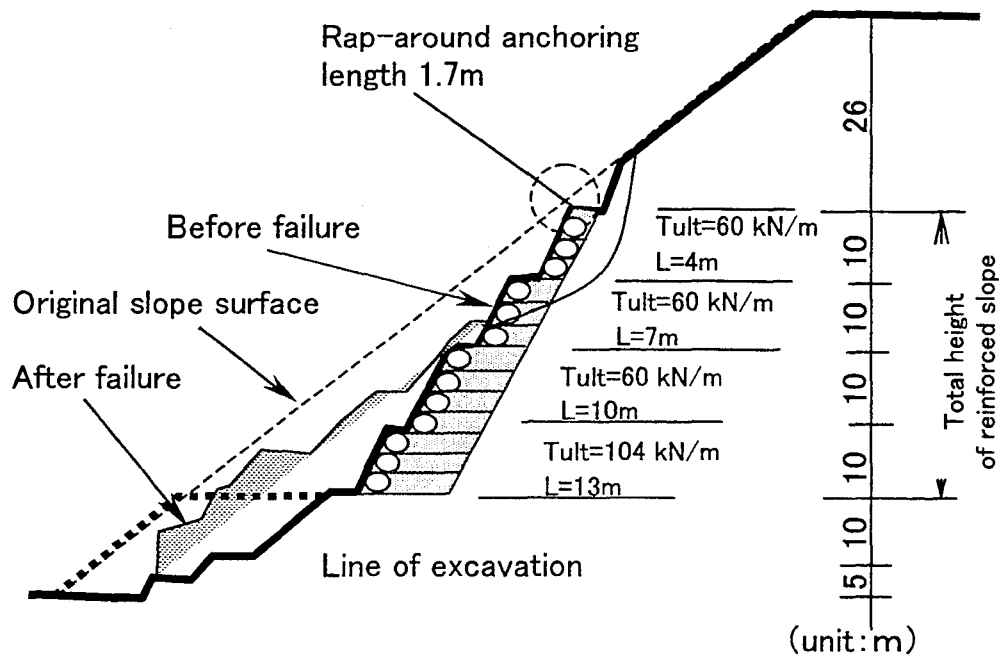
Cross section of the failed geosynthetic-reinforced soil retaining wall
